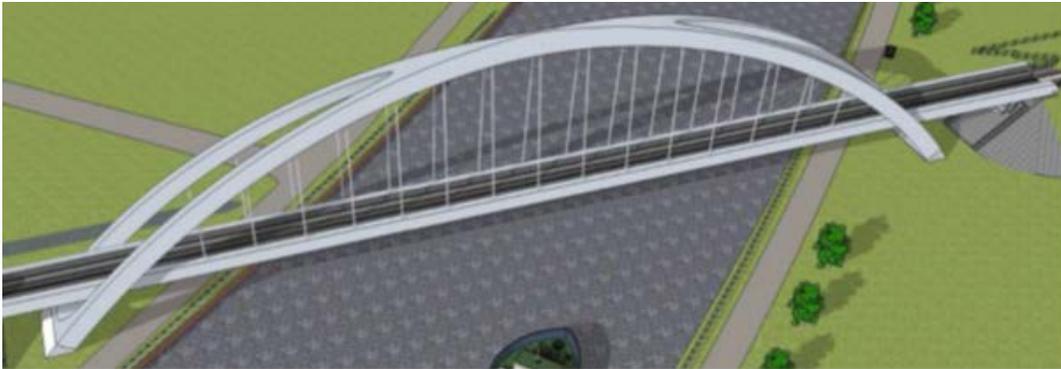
New steel design for the Zuidhorn railbridge. ©ProRail.
